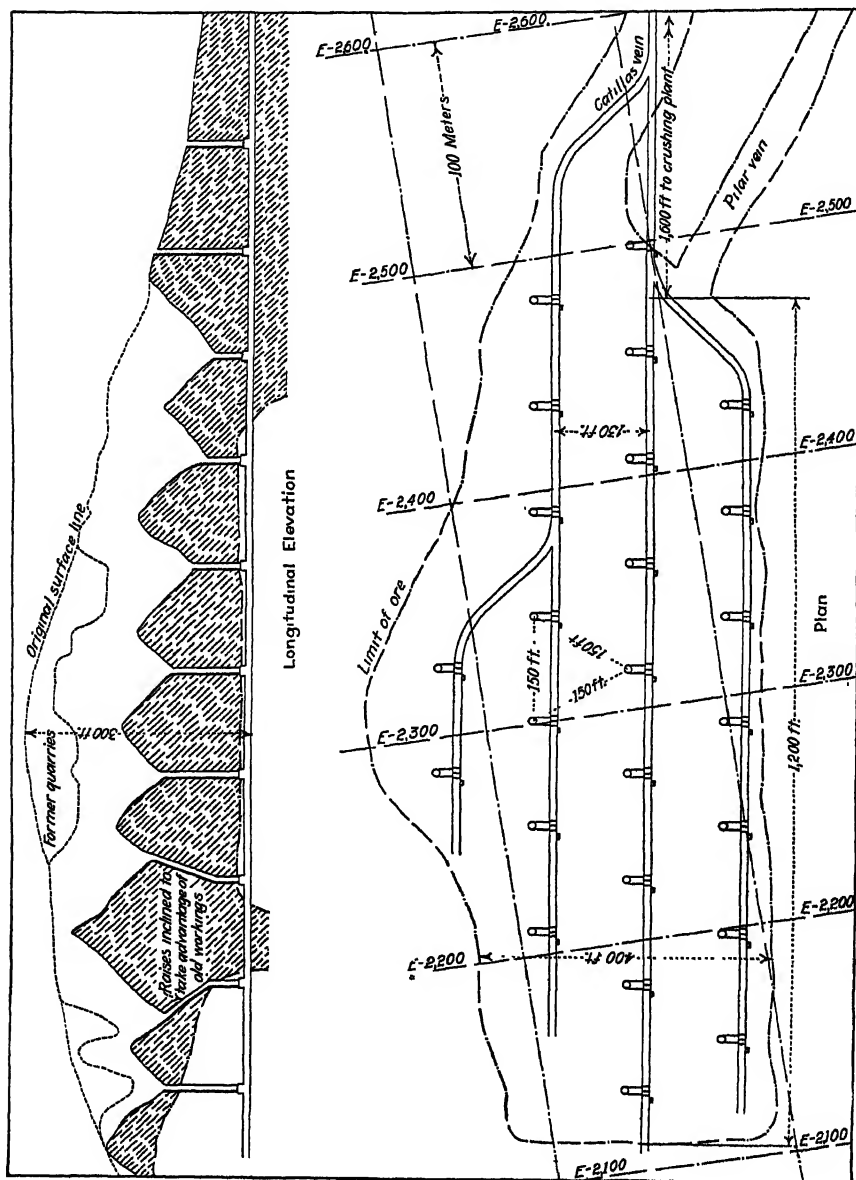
ARRANGEMENT OF HAULAGEWAYS AND GLORY HOLES AT FRESNILLO.
